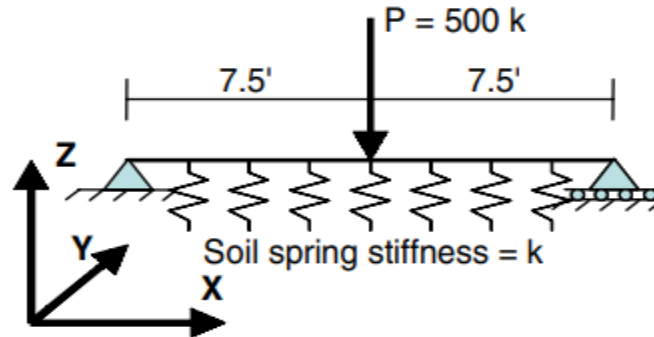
Simply Supported Beam on Elastic Foundation with Central Point Load
